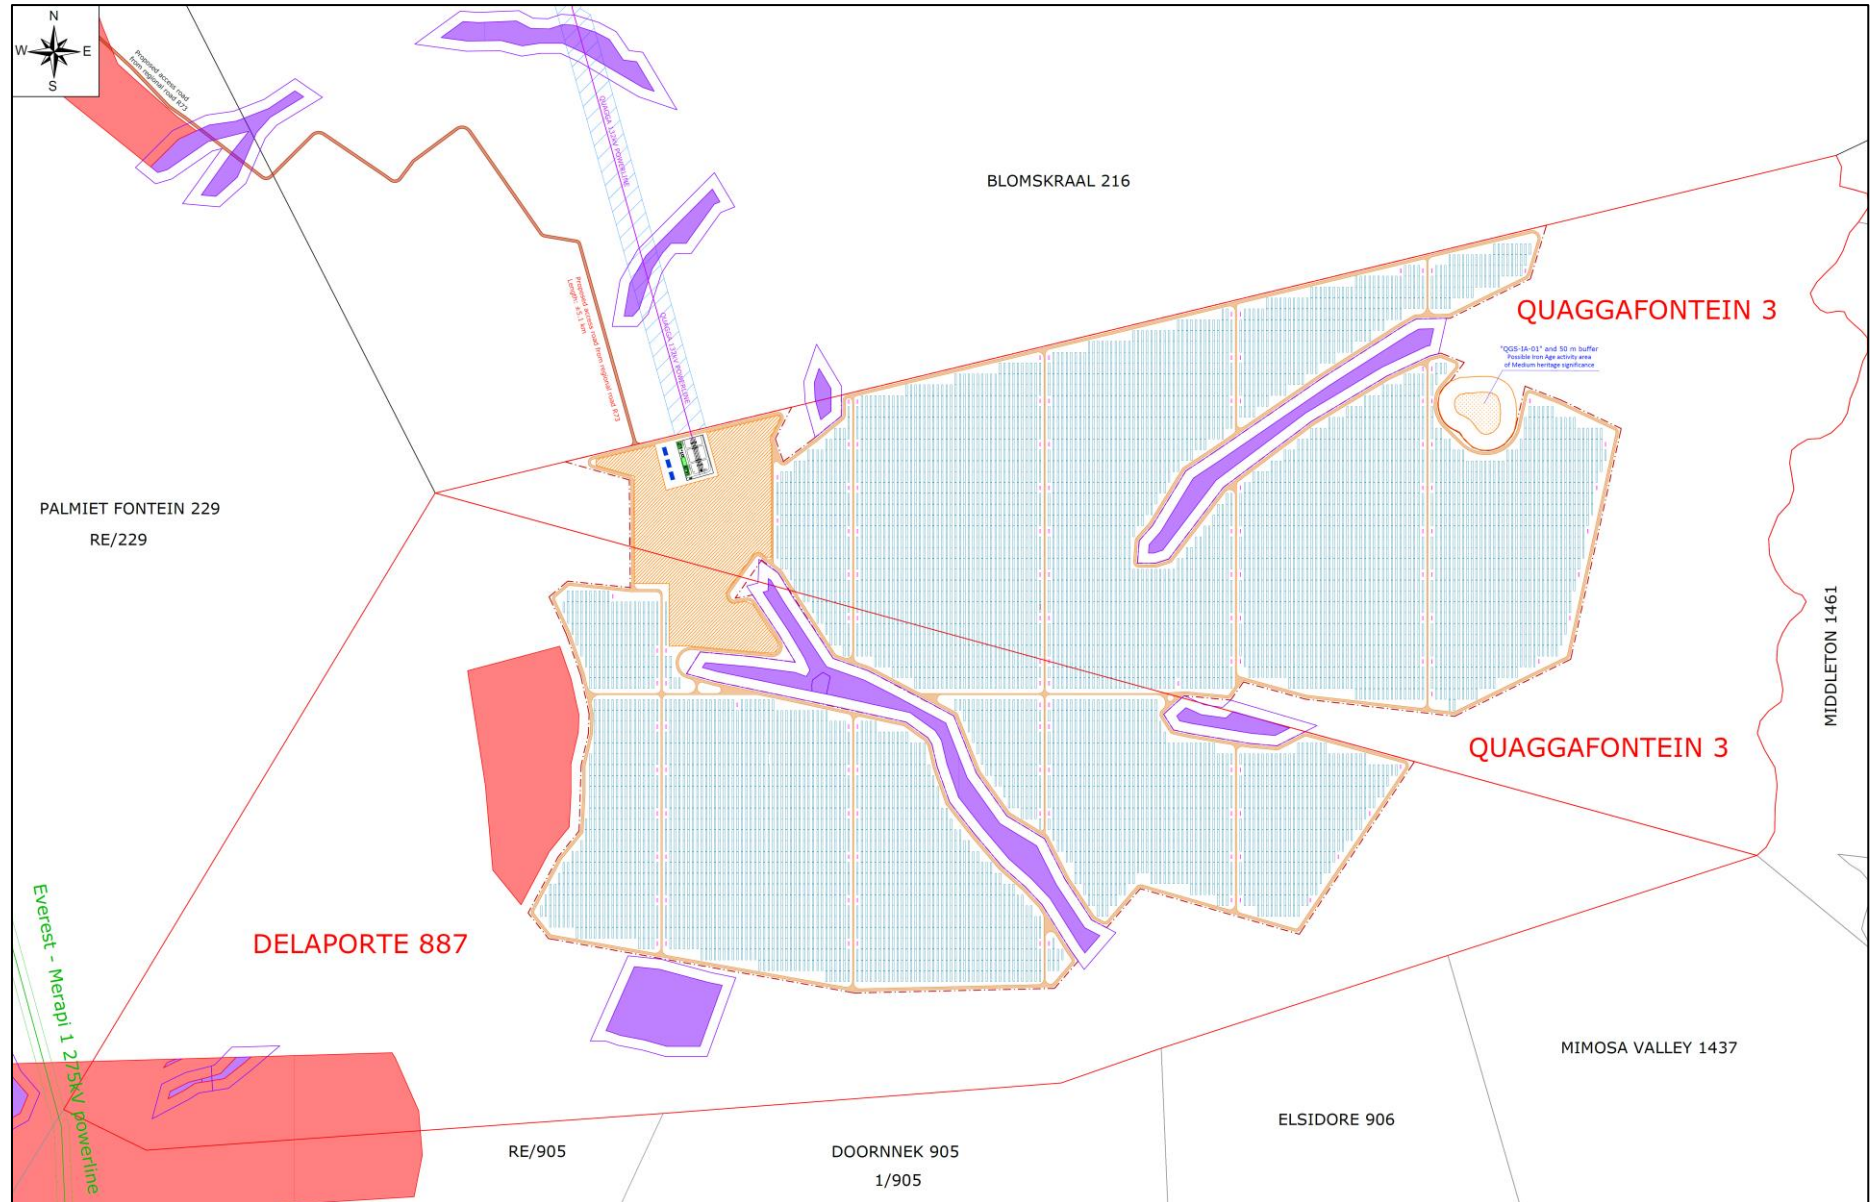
Proposed Layout Plan of the Quagga Solar Park
